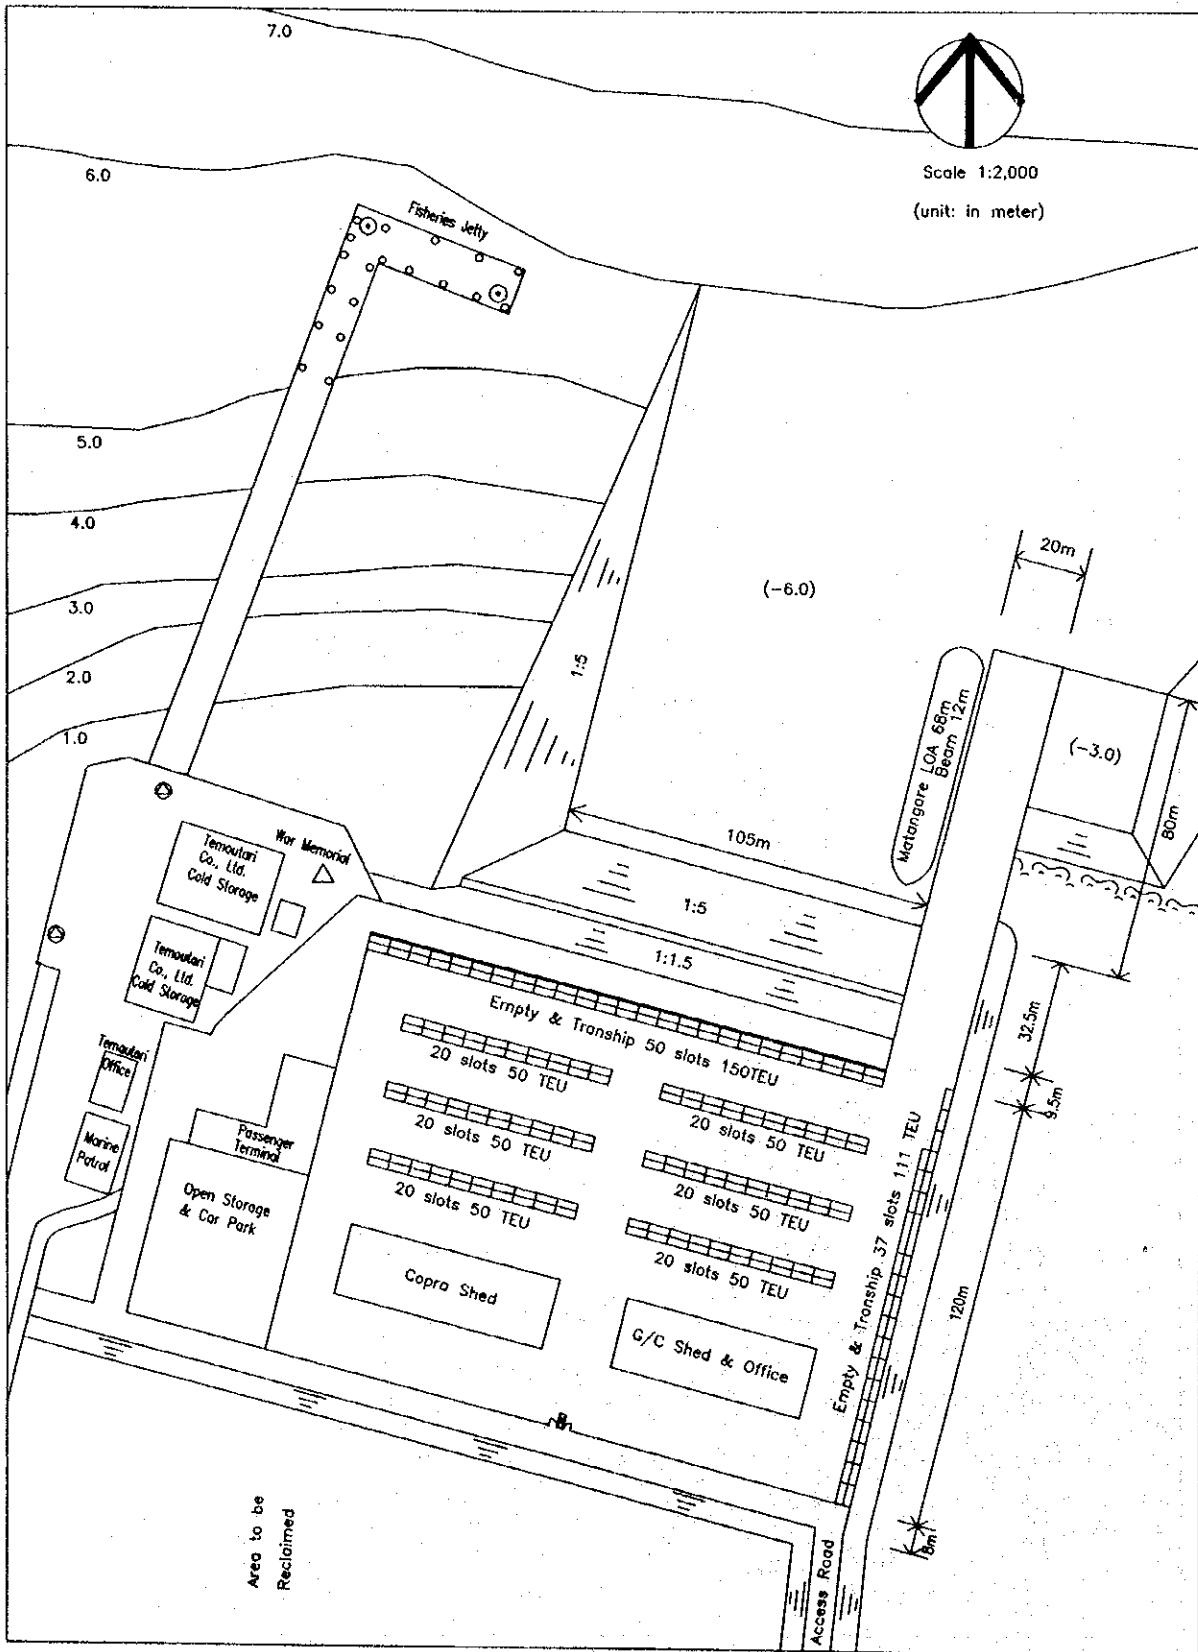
(2) Proposed Container Yard Layout Plan
